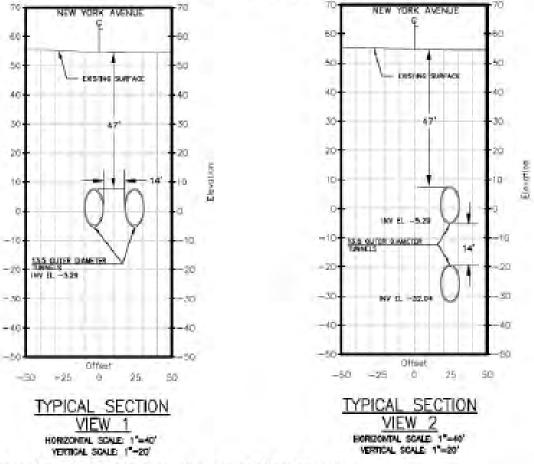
TYPICAL TUNNEL CROSS-SECTION SHOWING TWO POSSIBLE CONFIGURATIONS:
